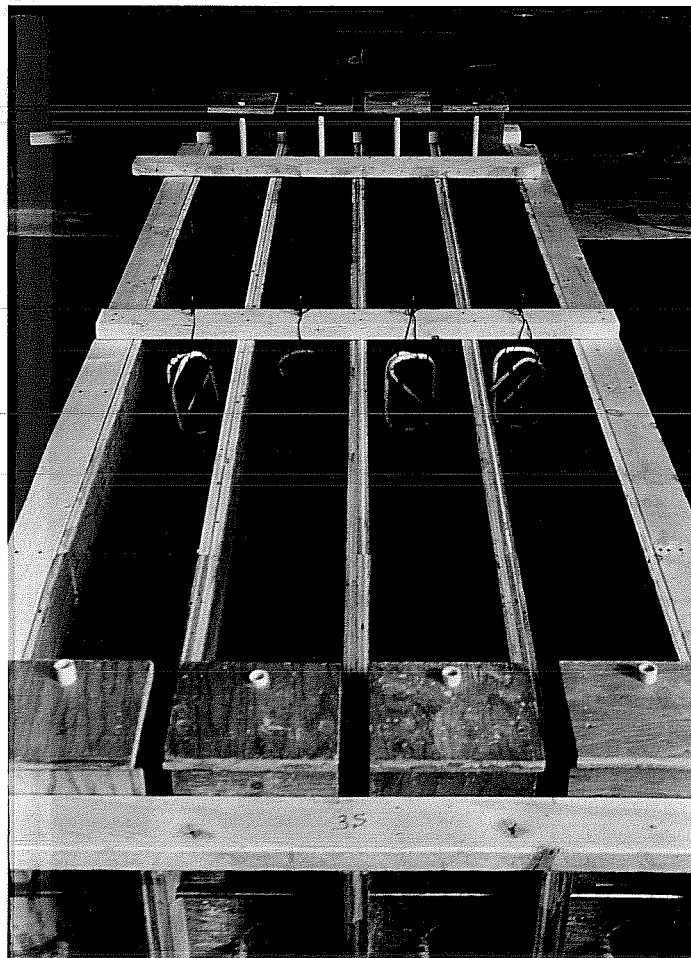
Stirrup Condition with Introduced Damage.
